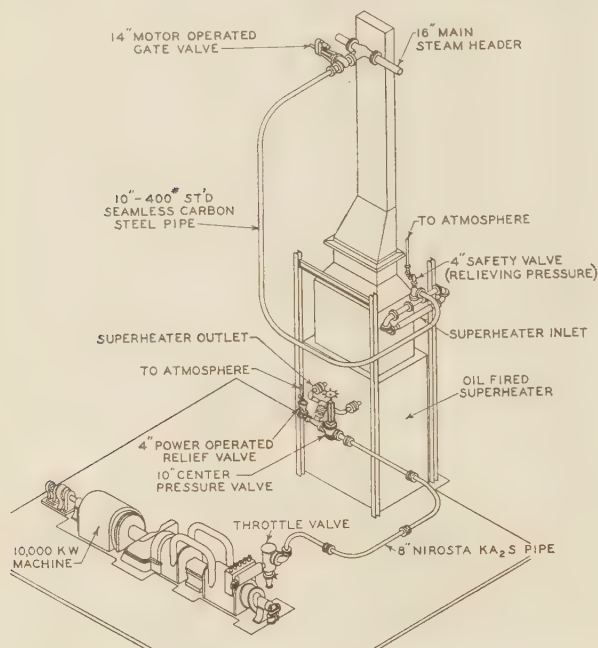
ISOMETRIC VIEW OF HIGH-TEMPERATURE INSTALLATION
